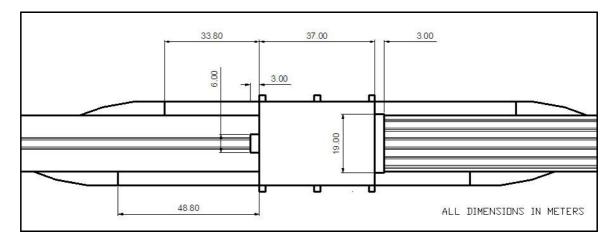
Top View Crossing Junction Switch Cover Dimensions
